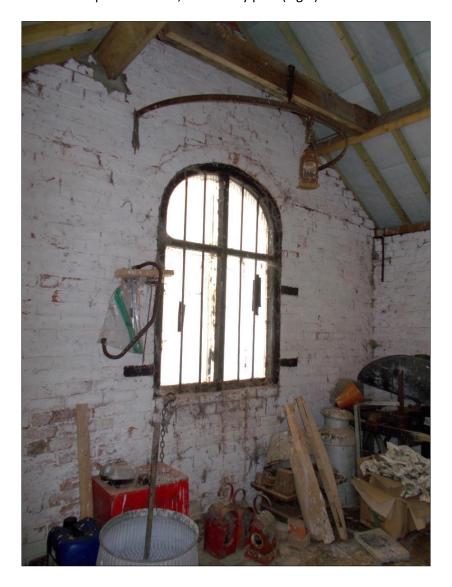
The arched window in the east gable wall, looking south-east with semi-circular hanging rail above.
